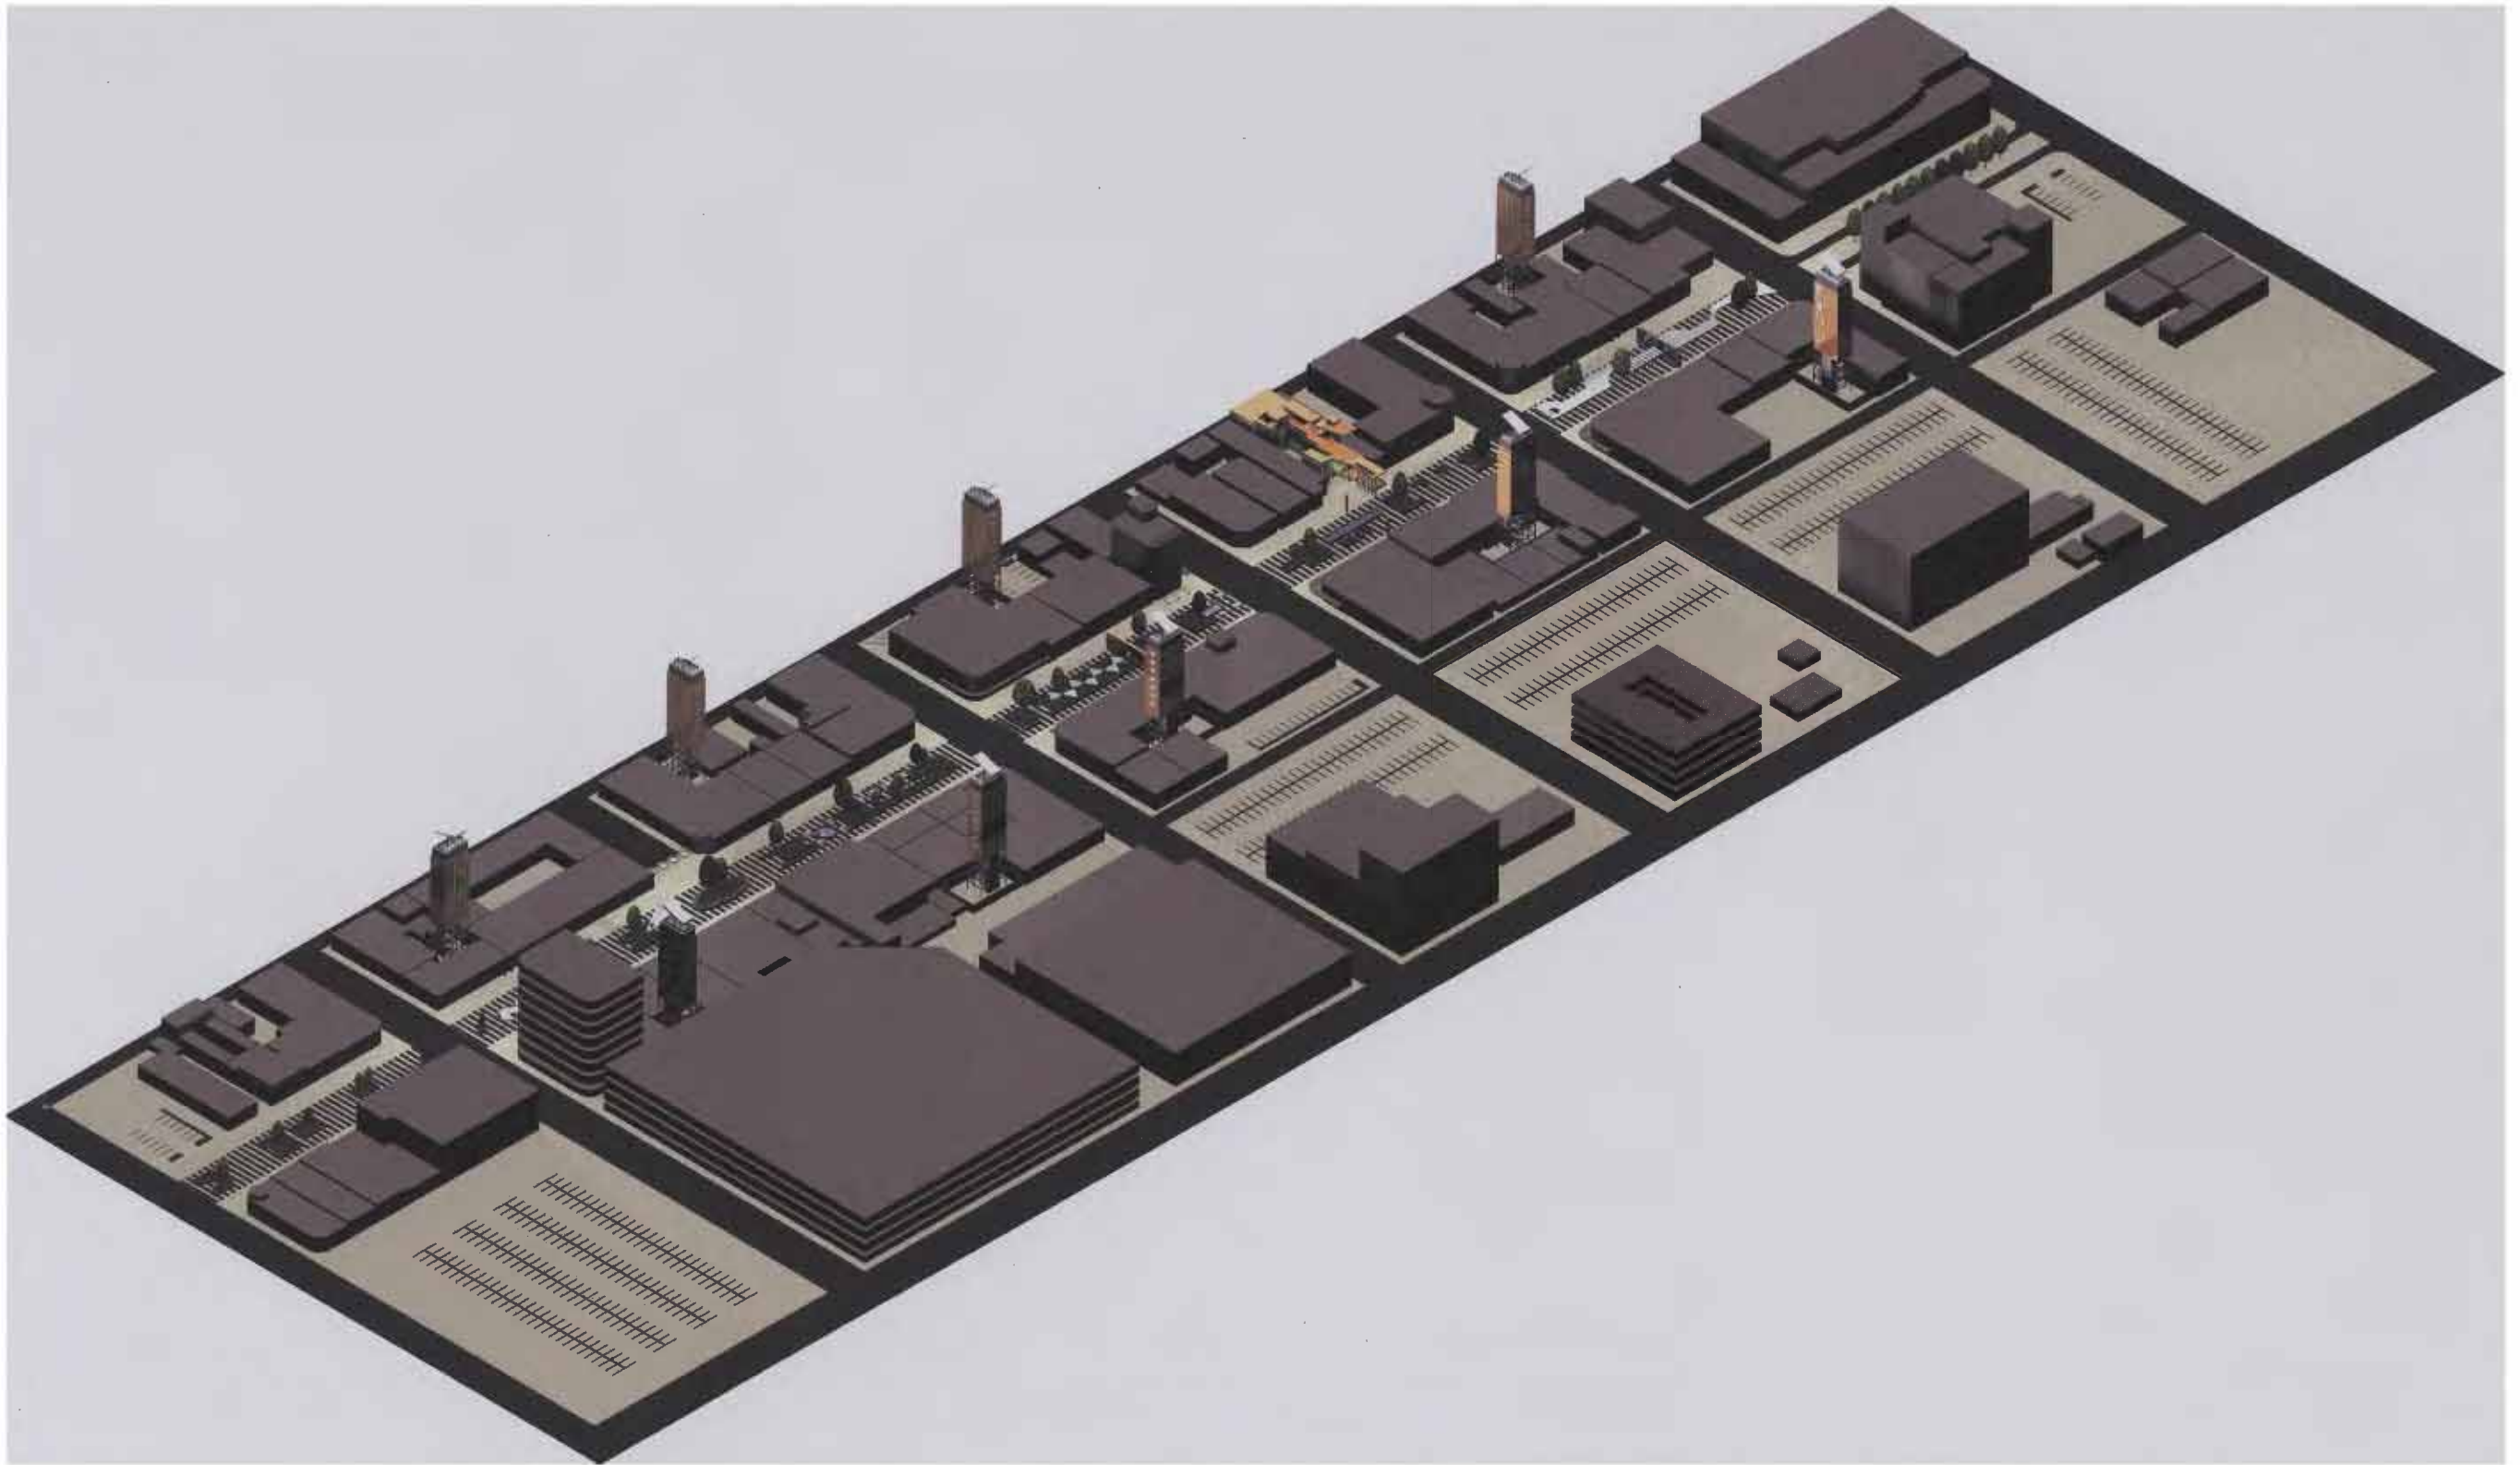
Three Dimensional Rendering of Site with Studio Towers and Gallery.
